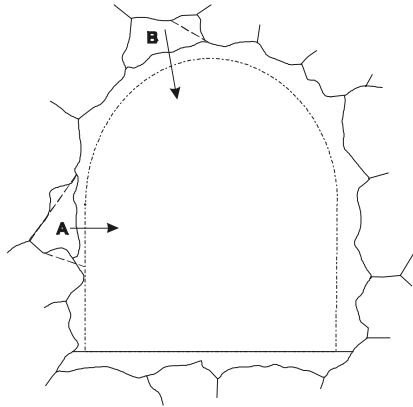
Possible instability in jointed rock masses exposed to high rock stress level (from Terzaghi, 1946).
